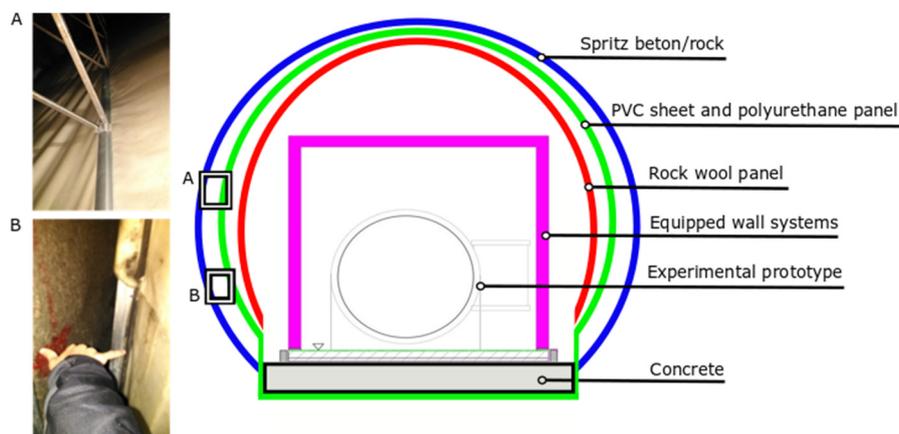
Sketch of gallery cross section evidencing the interspace between spritz beton/rock layer and polyvinyl chloride (PVC) panels: detail A shows the aluminum structure, detail B the interspace length ( $\cong 20$  cm)
